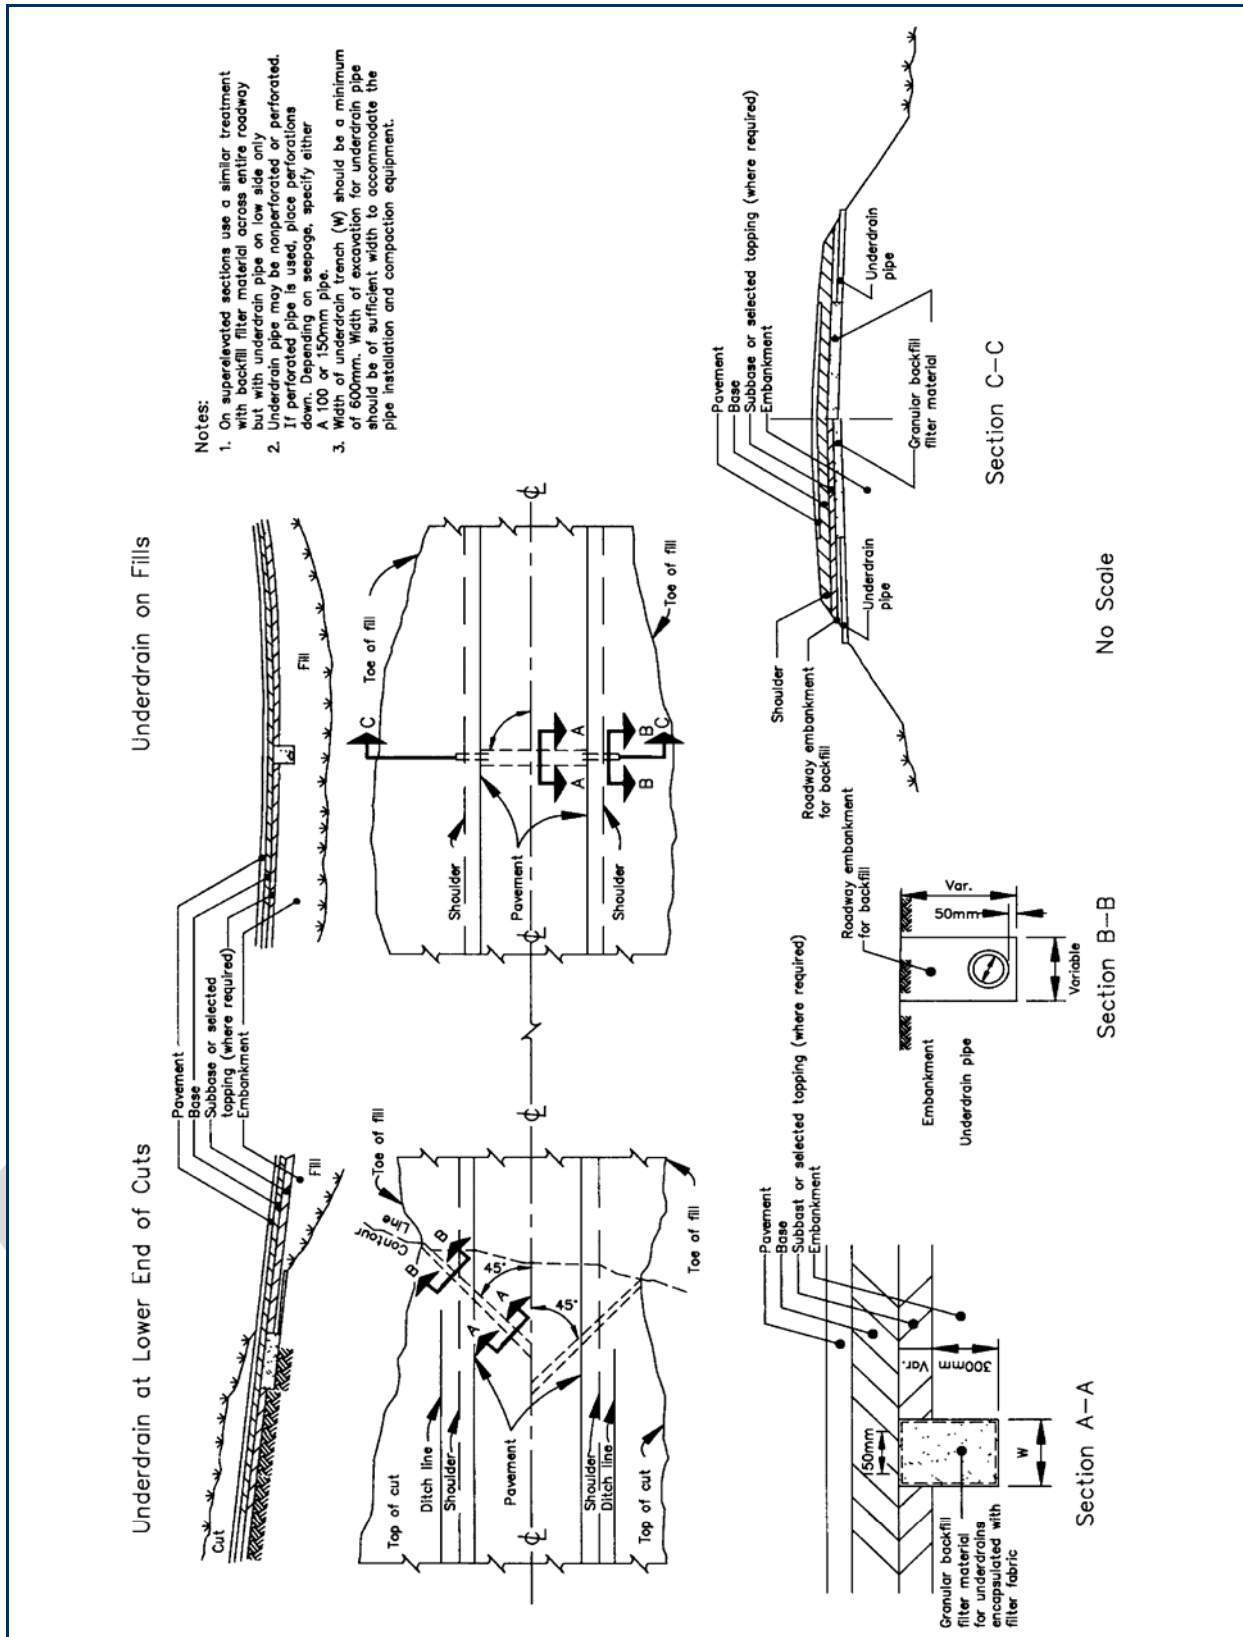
D TYPICAL UNDERDRAIN INSTALLATION FOR SPRING AREAS (Metric)
